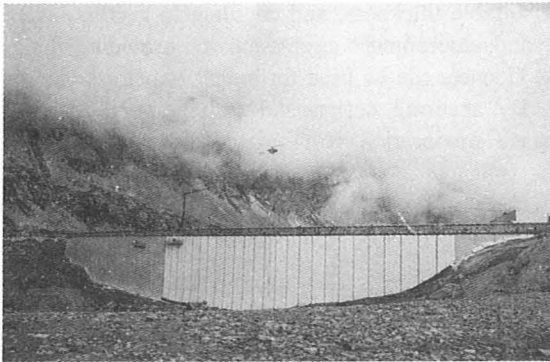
A thick transition geotextile installed over the masonry facing avoided smoothening of the surface and allowed to transport all material by helicopter to reach a site with no access road
